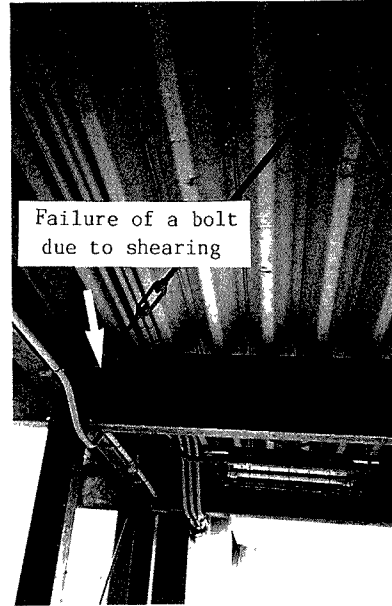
Damage in an end connection of a horizontal brace: Chonan junior high school.
